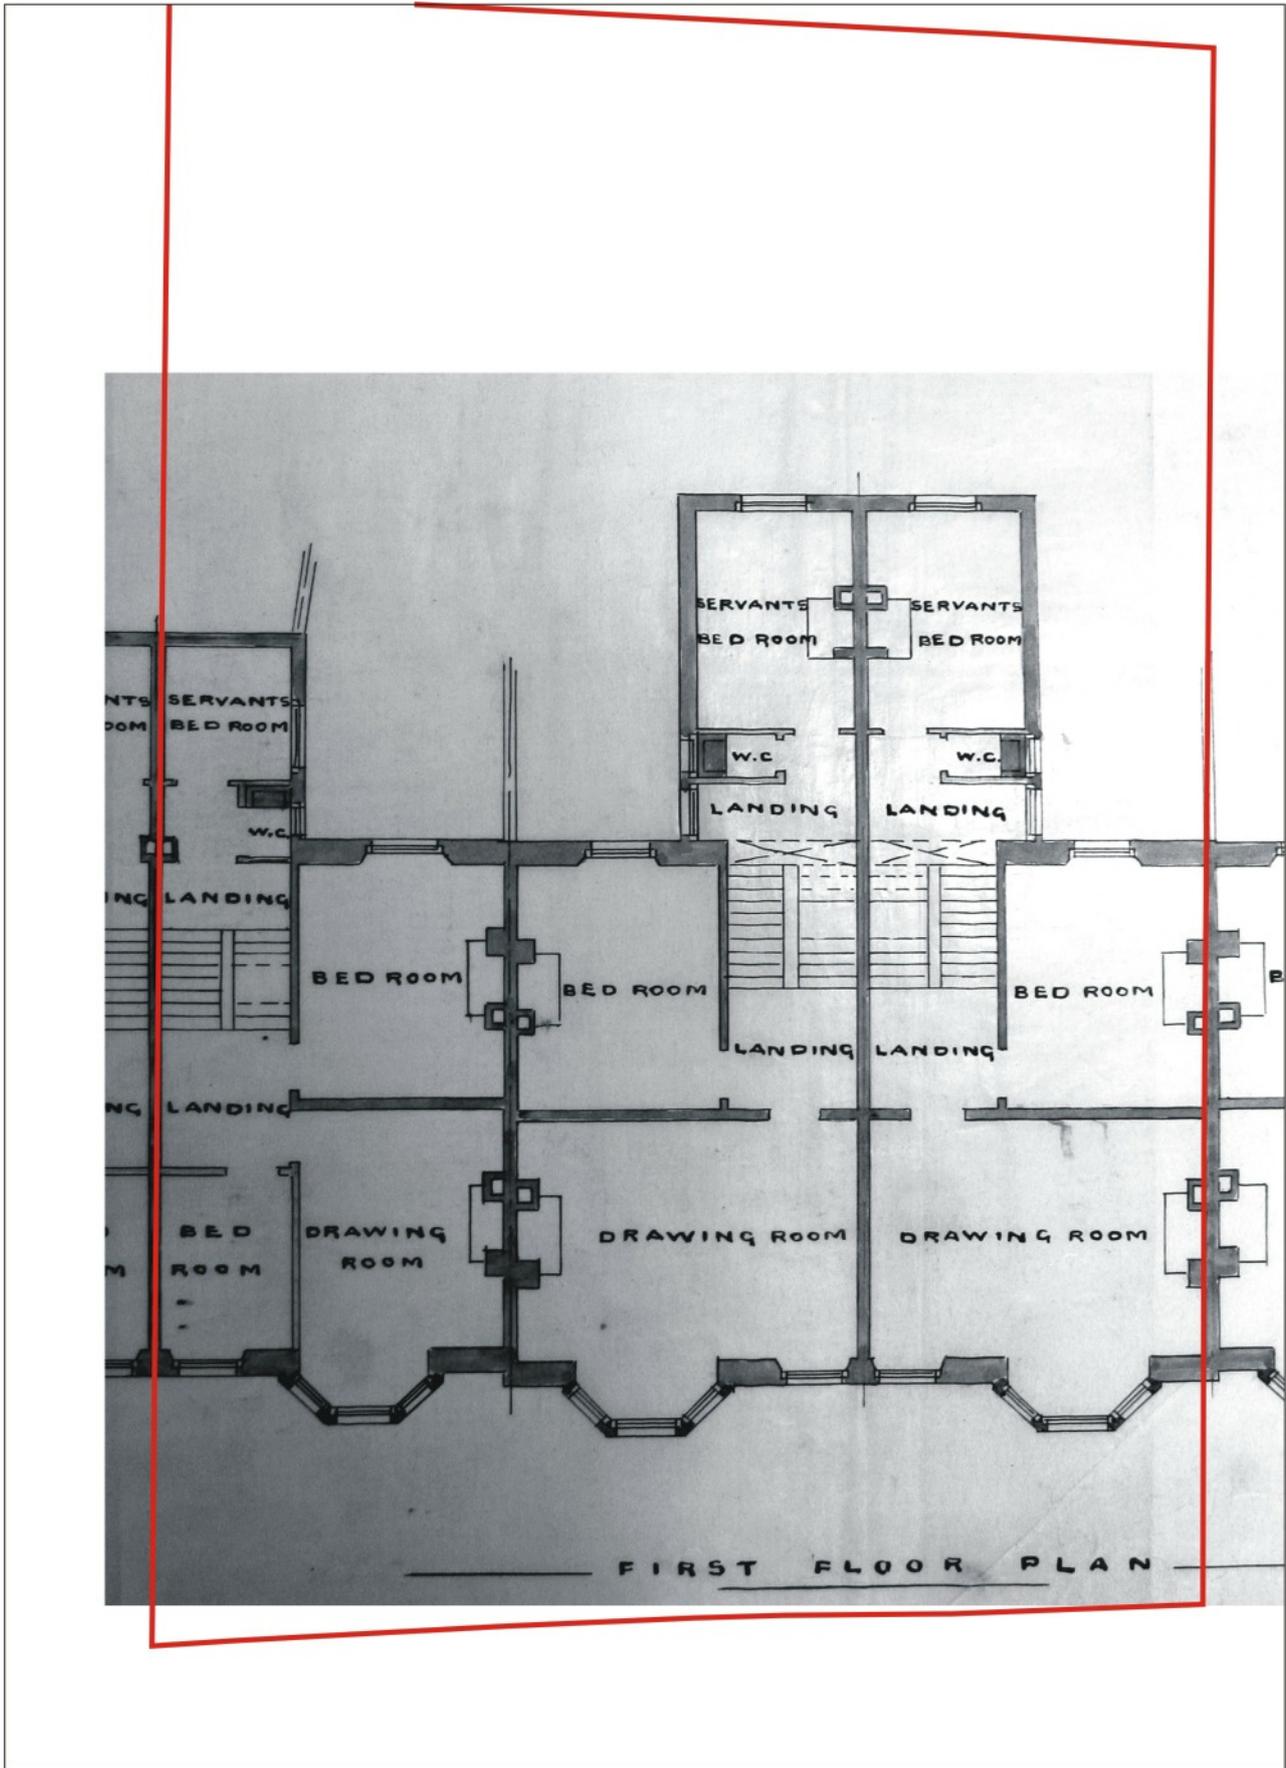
Dodds' 1870 plan "Plan of nine houses to be built at Cullercoats". First floor. Red line denotes site boundary.
